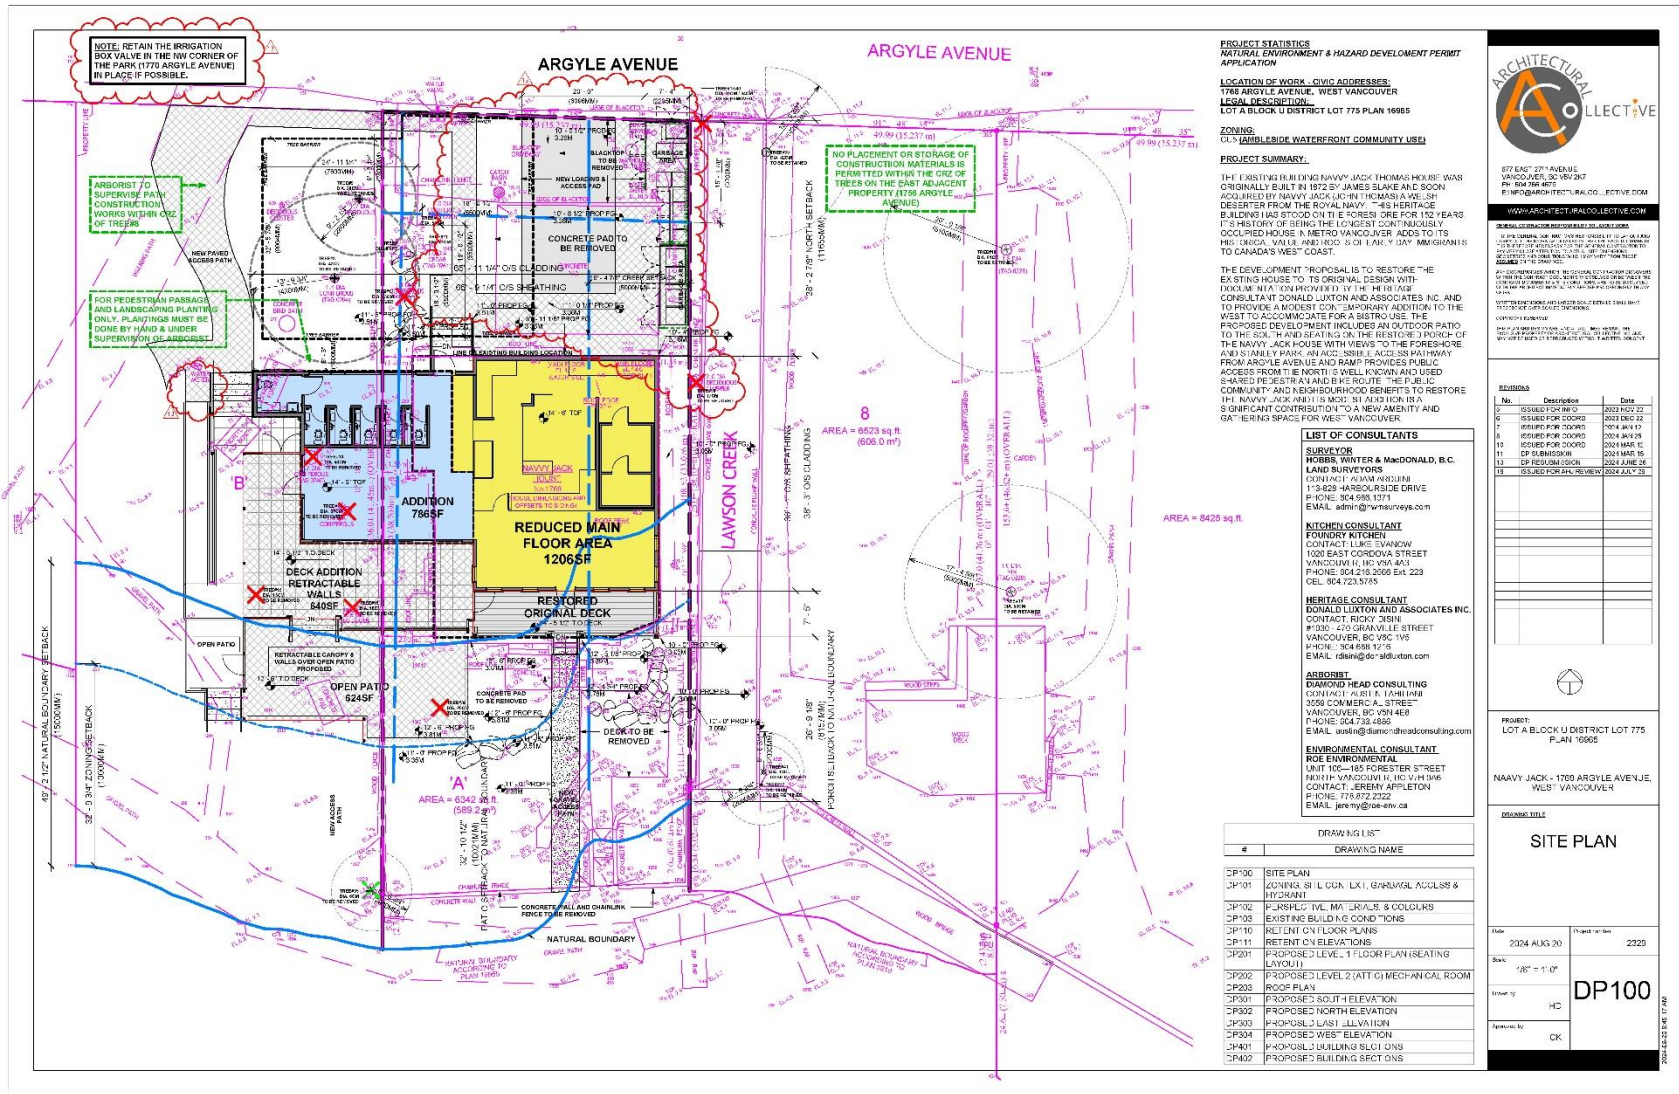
Site Plan for 1768 Argyle Avenue. Architectural Collective, August 20, 2024.
